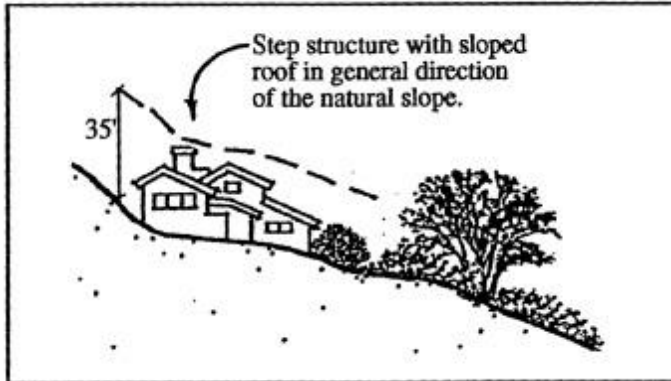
RELATING BUILDING FORM TO TERRAIN
